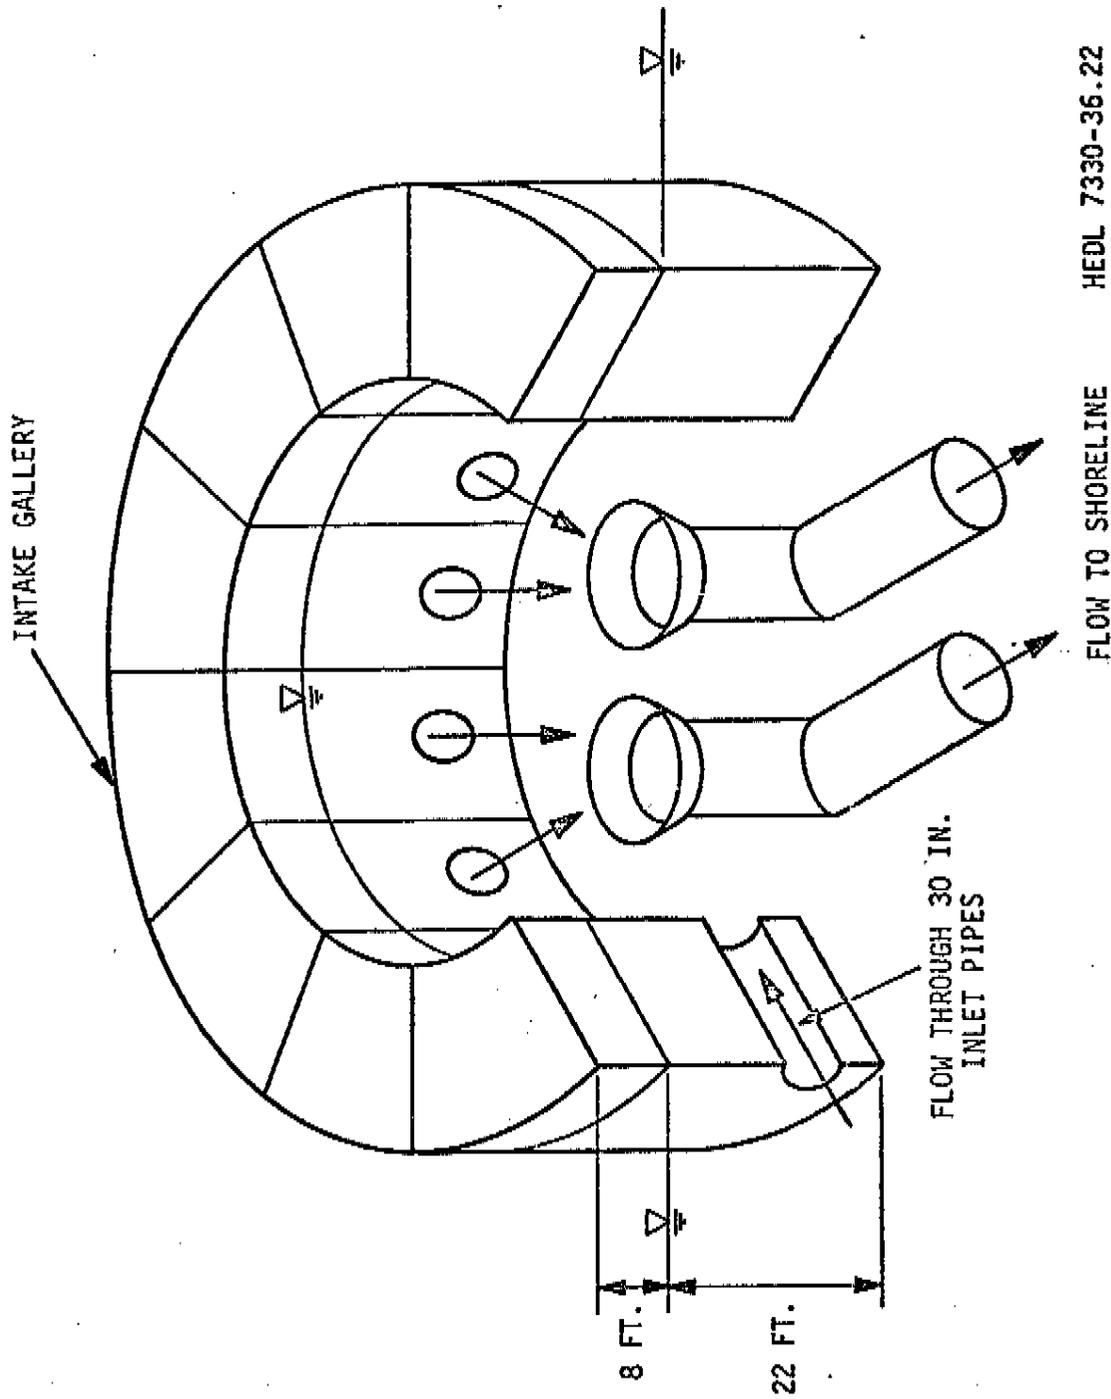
Intake Structure of Point Beach Nuclear Plant.
